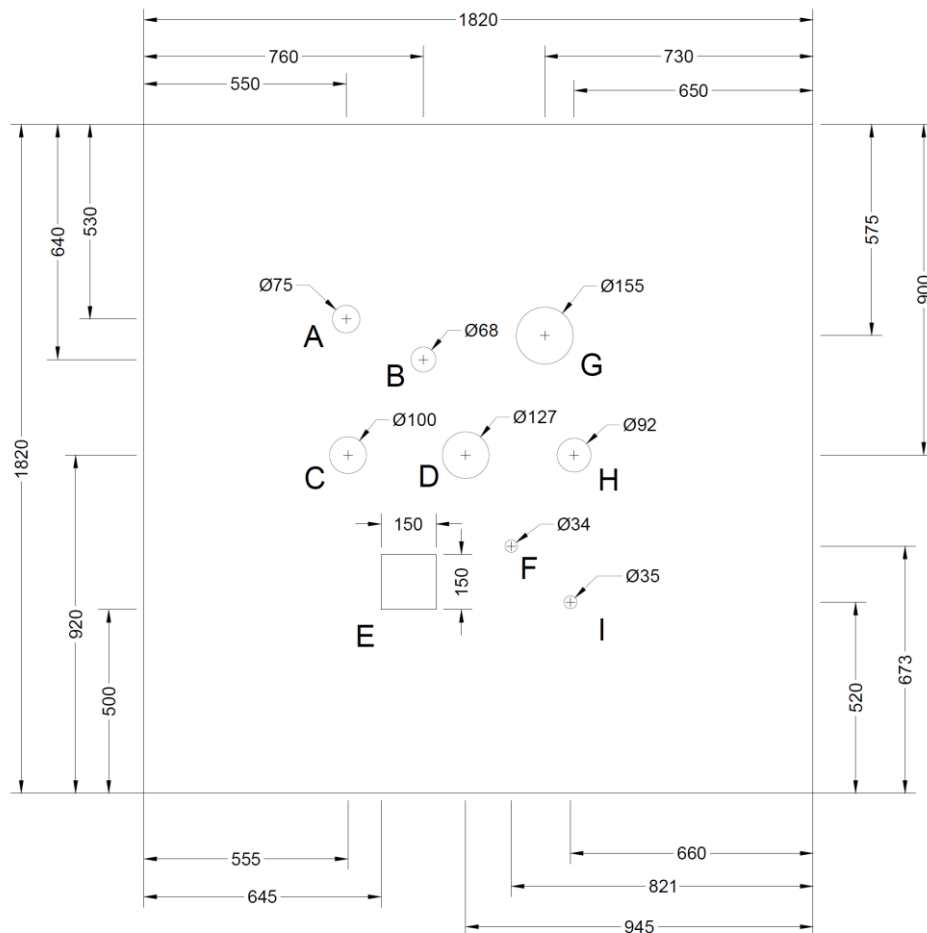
Plan view of test specimen (Core hole size and location on unexposed side)
